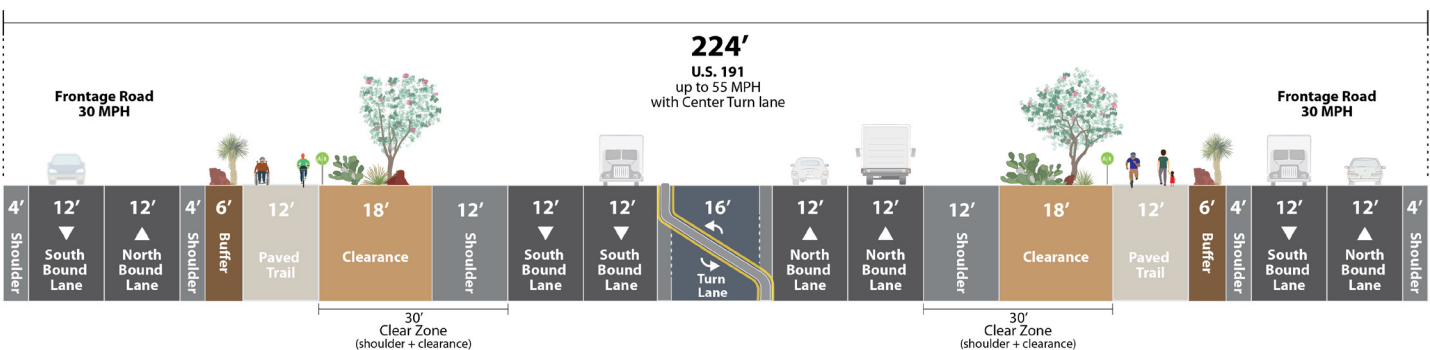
Trail between US-191 & Frontage Road – Two-way frontage road options.
